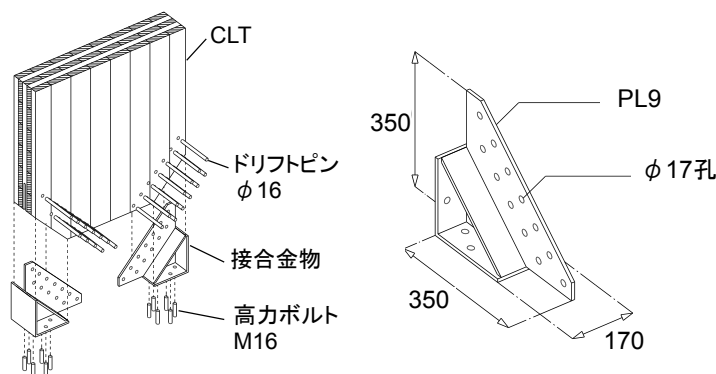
Leg joint of CLT shear wall with drift pin connections.
